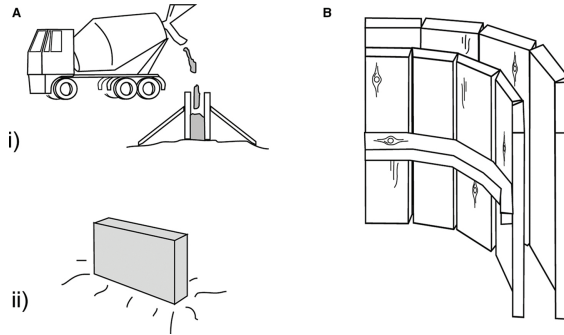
(a) Conventional procedure in construction: (i) pouring concrete into formwork, (ii) finished de-cored wall and (b) construction made by a carpenter: curved wall structure.
